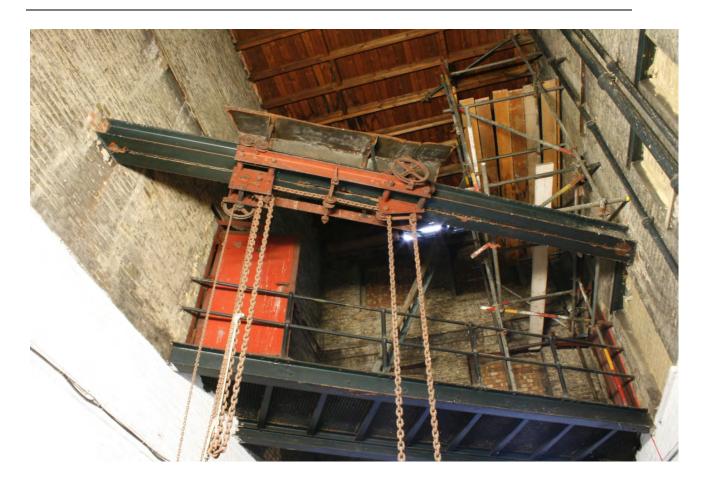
Overhead bridge and winching mechanisms within passageway from the main workshop area of the garage to the parking area beyond, looking south-west (72FmLa D100 053)
